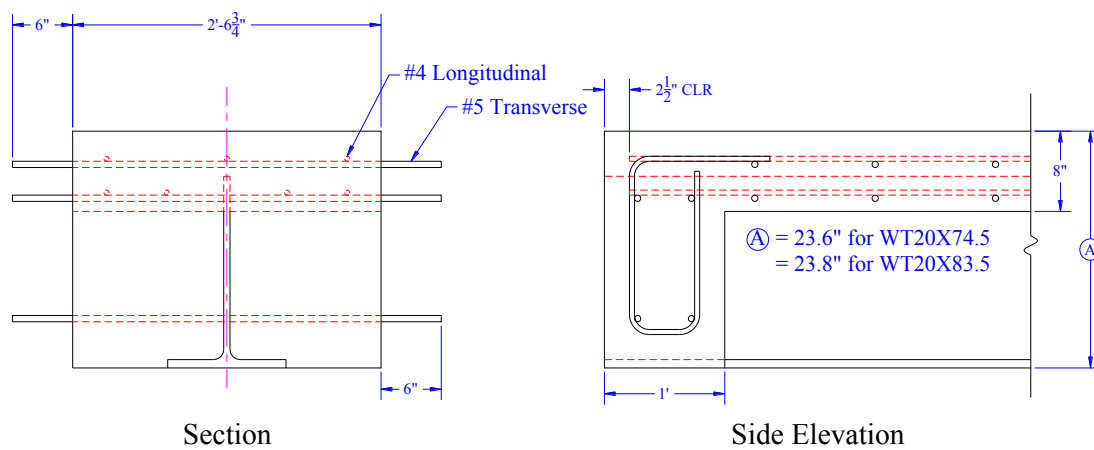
End diaphragm details (Aghi, Naito & Sause, 2014)
